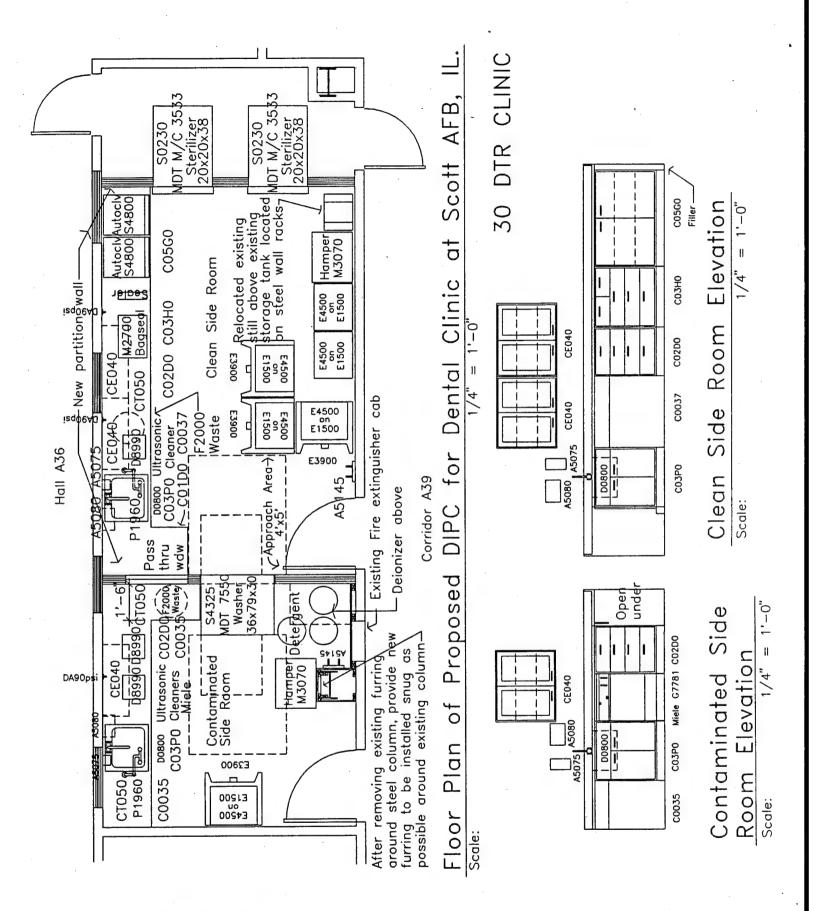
Medium Dental Instrument Processing Center Floor Plan
